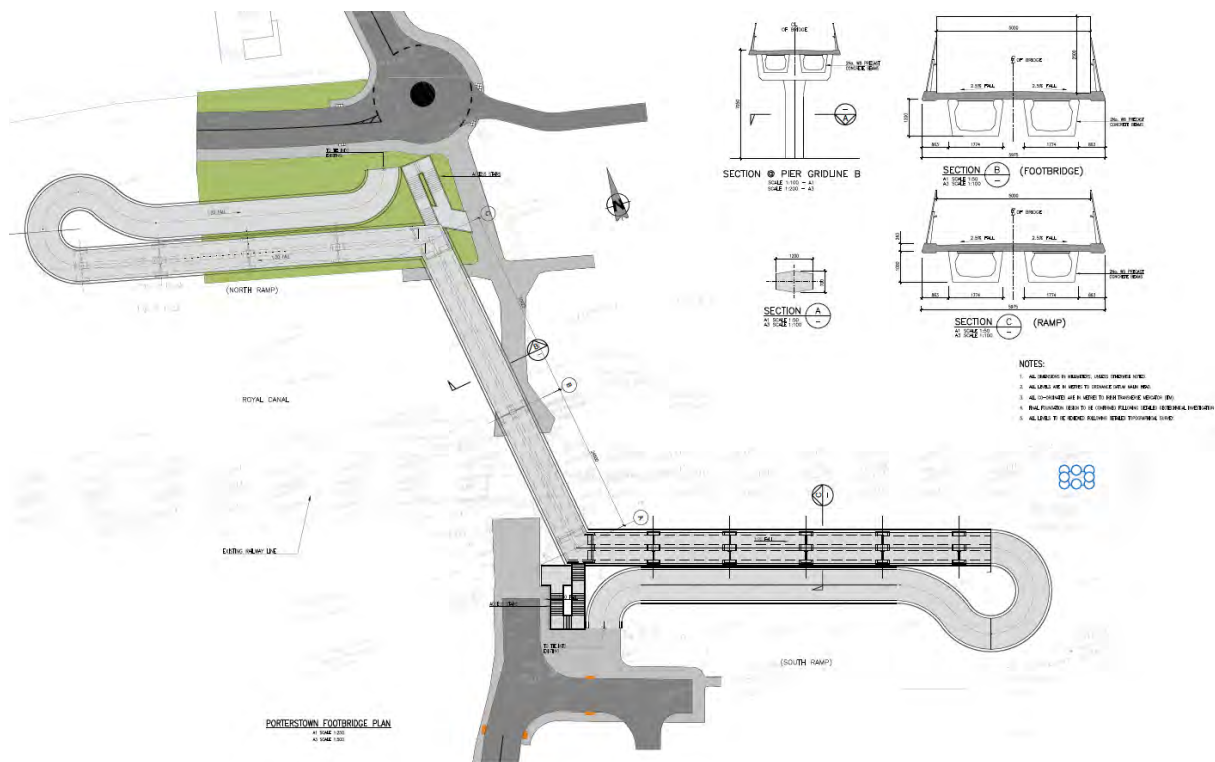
Proposed pedestrian and cycle bridge at Porterstown
